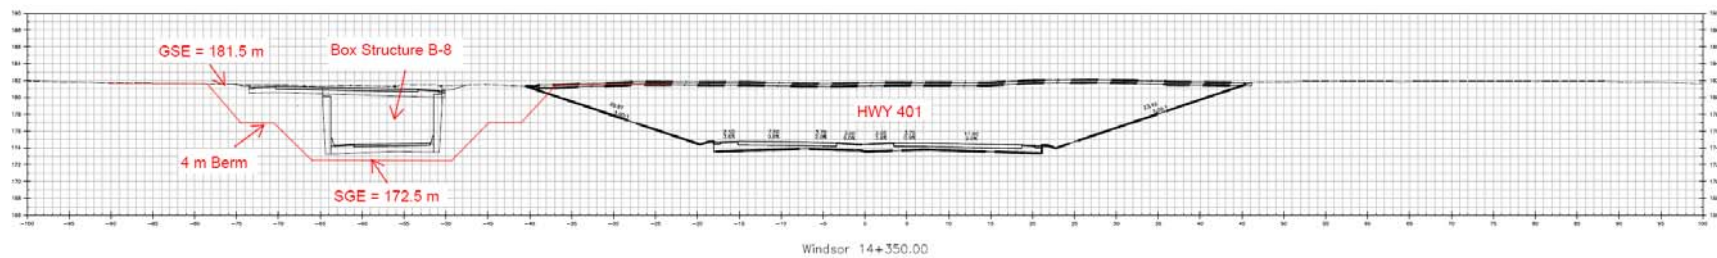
Temporary Excavation Profile for Box Structure B-8 at Station Windsor 14+350
